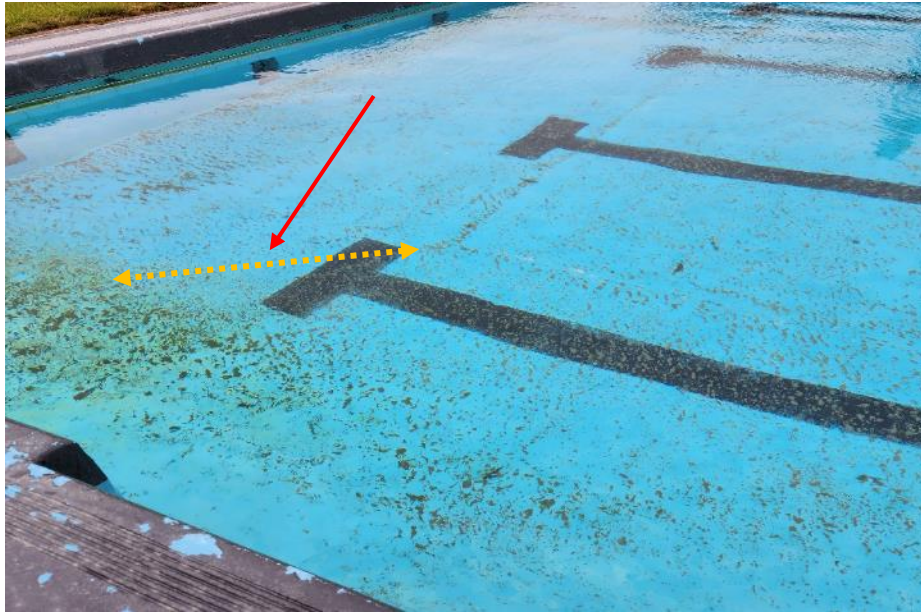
Main pool, SE corner. Diagonal crack in floor from corner of construction joint
